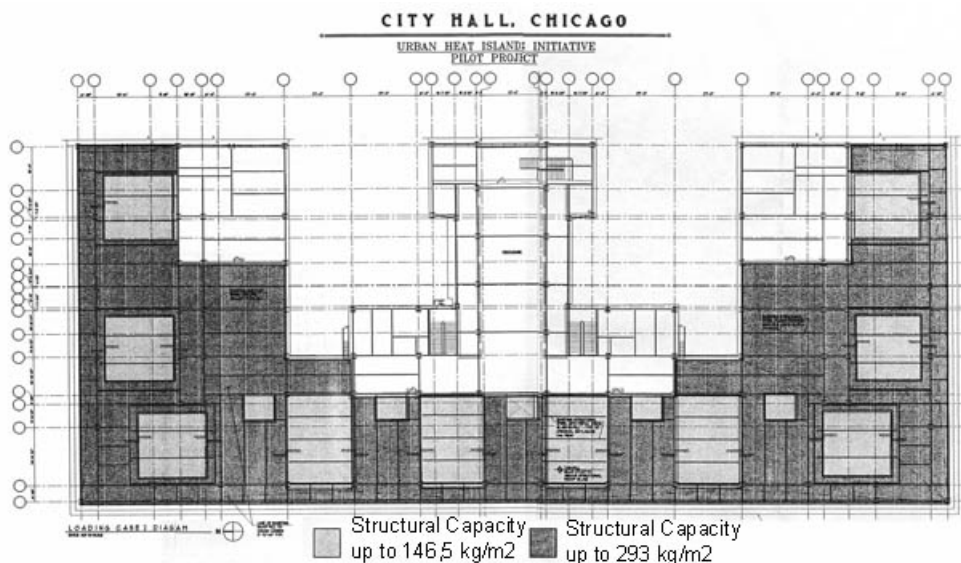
Map showing structural capacity of existing roof deck and potential excavated area.
